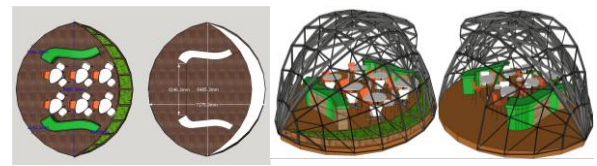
(Left) floating building plans; (Right) perspective of floating building with the roof frame.
